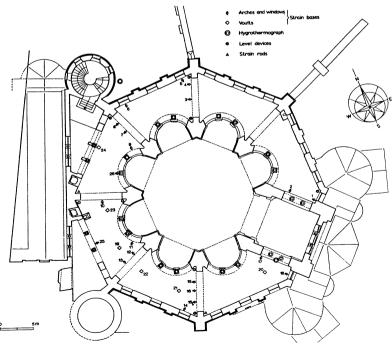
Floor plan of basilica of S. Vitale, indicating installation sites of survey instruments.
